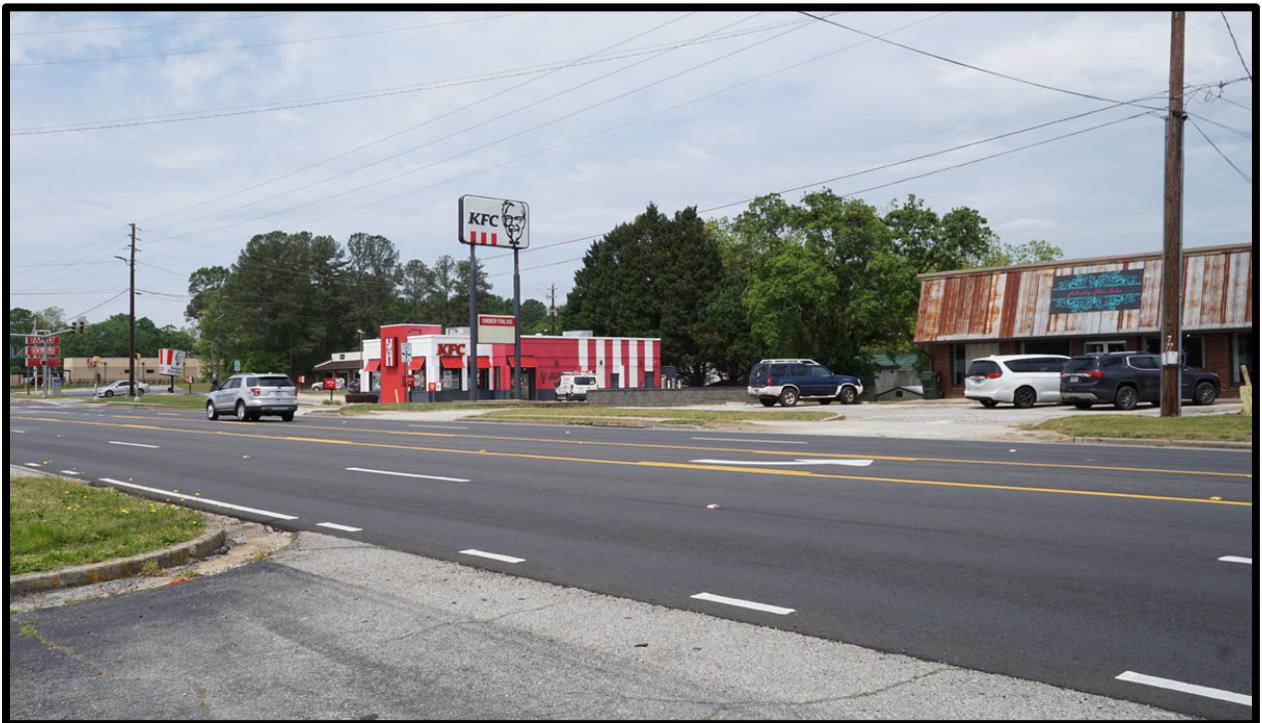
looking north on Big A Road; Glendale Street is just past the KFC
